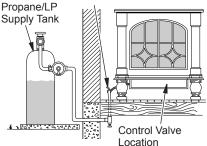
Checking Gas Joints (Propane/LP Gas Only)
